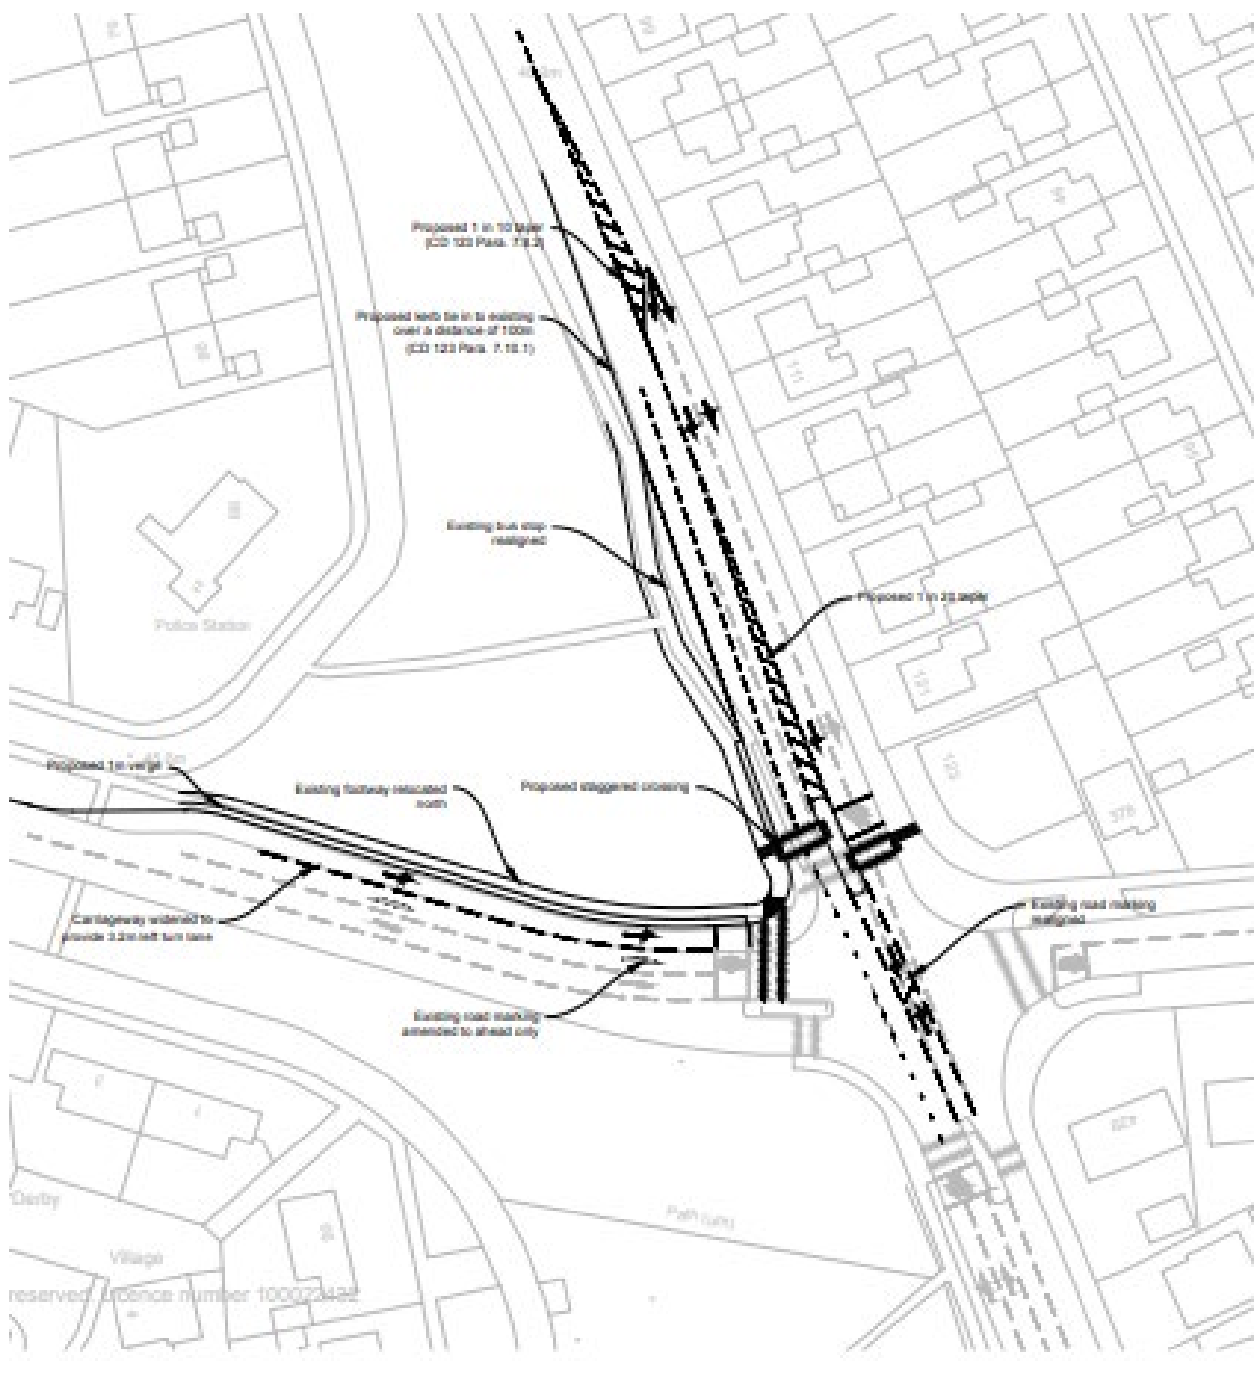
Merrill Way/A514/Boulton Lane Improvement
